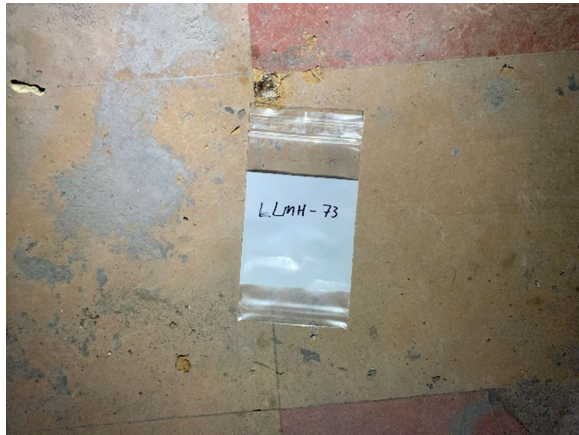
HA24: Beige 9"x9" floor tile and mastic, asbestos containing
